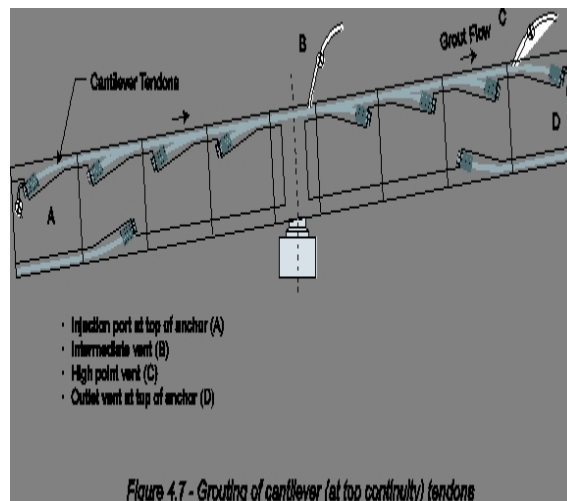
Grouting of cantilever (at top continuity) tendons
